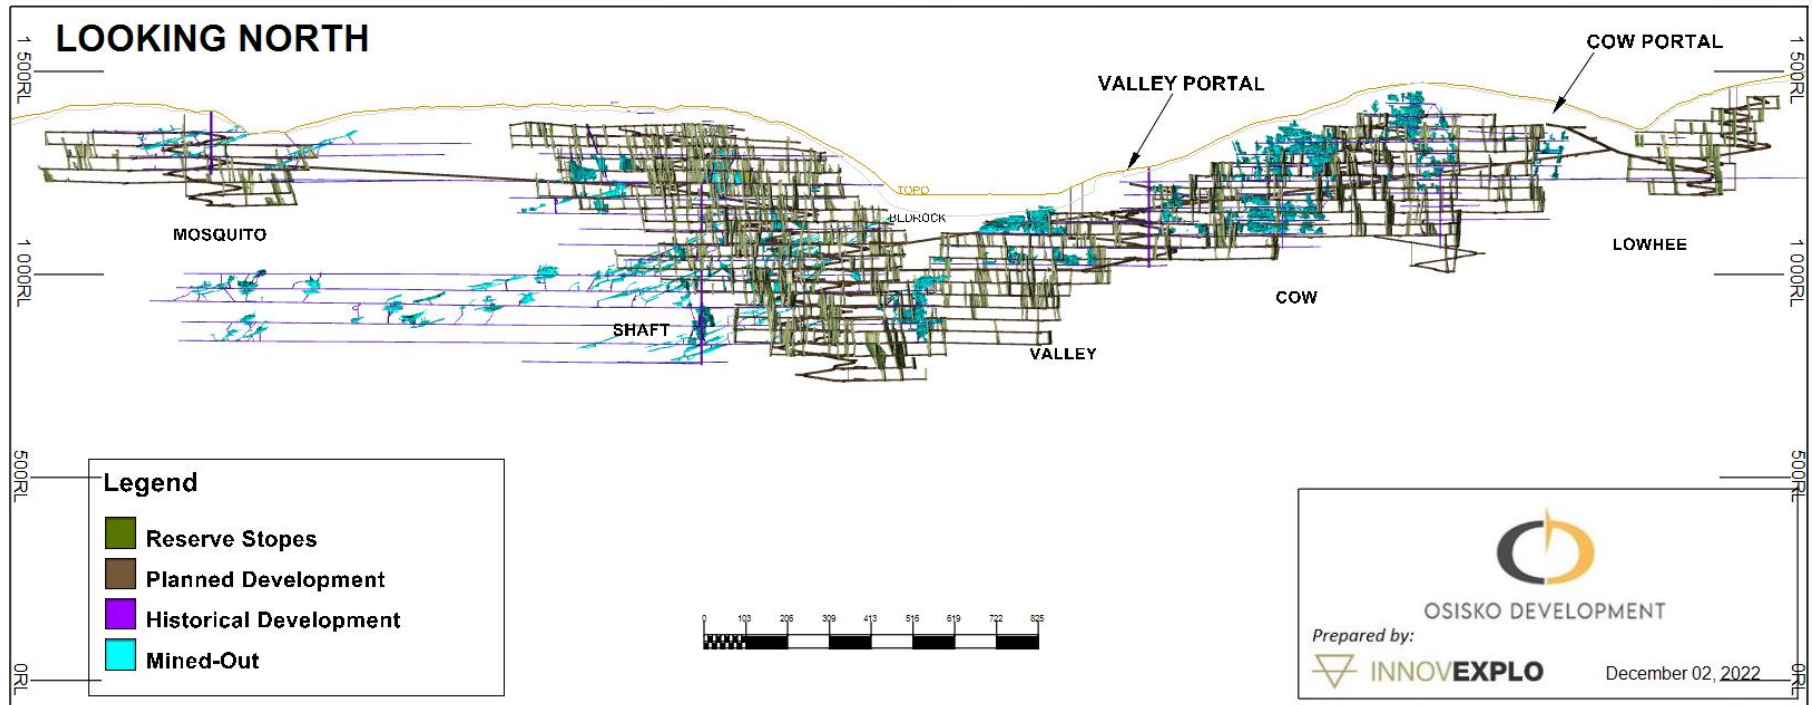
Cariboo Gold Project – Longitudinal section looking north
